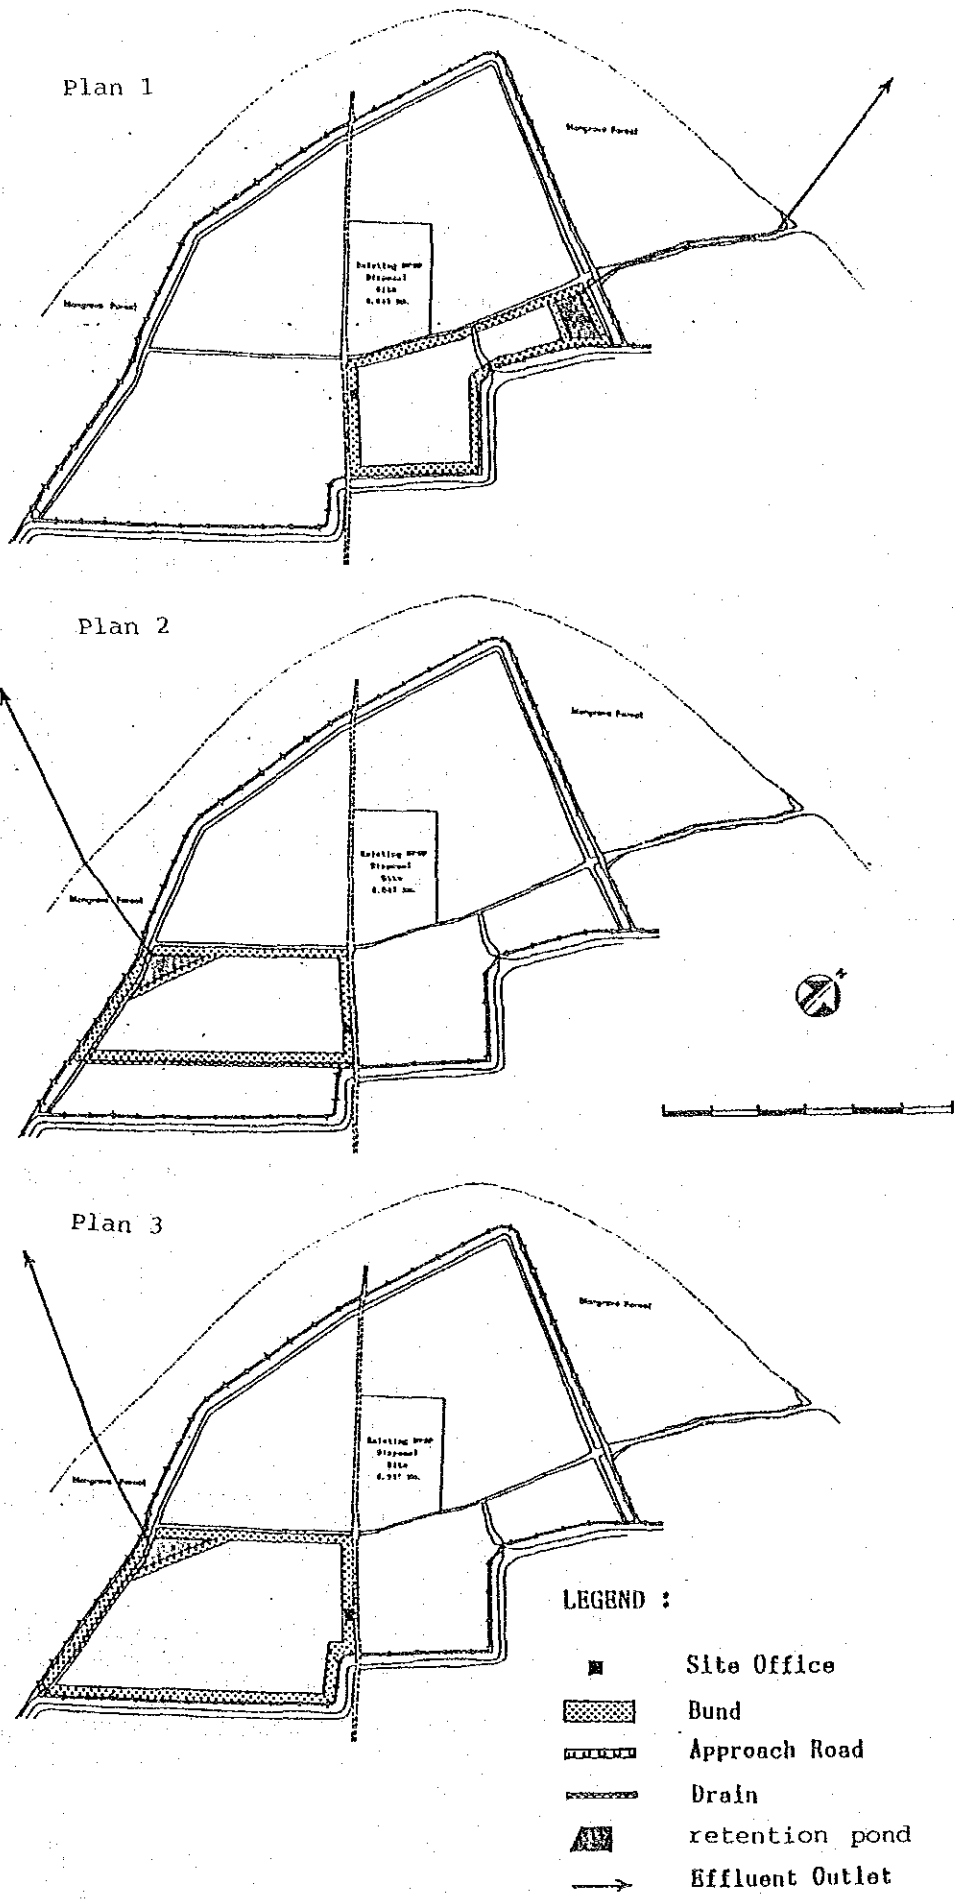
Concept Plan for First Phase Project of PBDS
